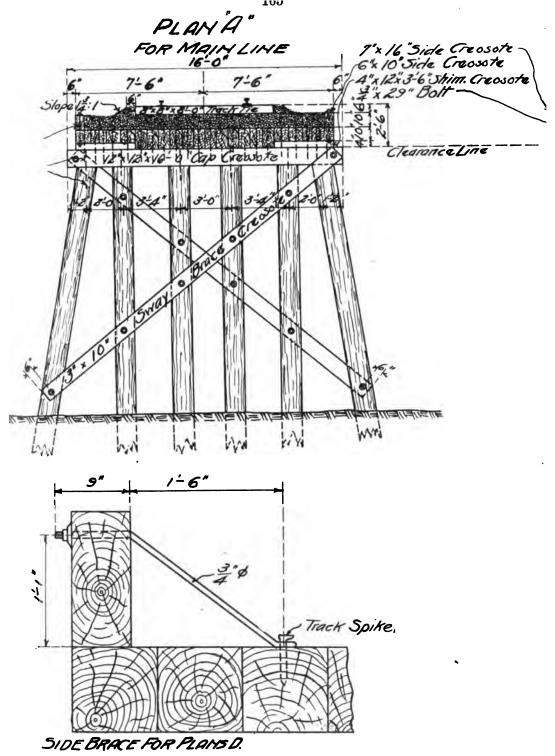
Ballasted Wooden Trestle, Santa Fé System.
